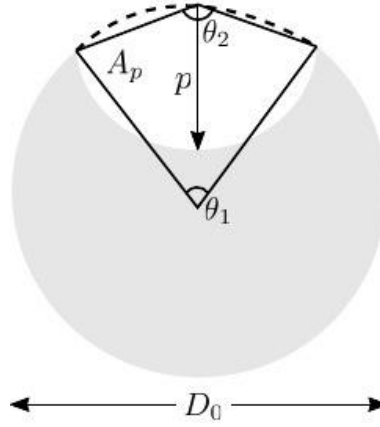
Pitting corrosion configuration in the cross-section of a reinforcing steel bar.
